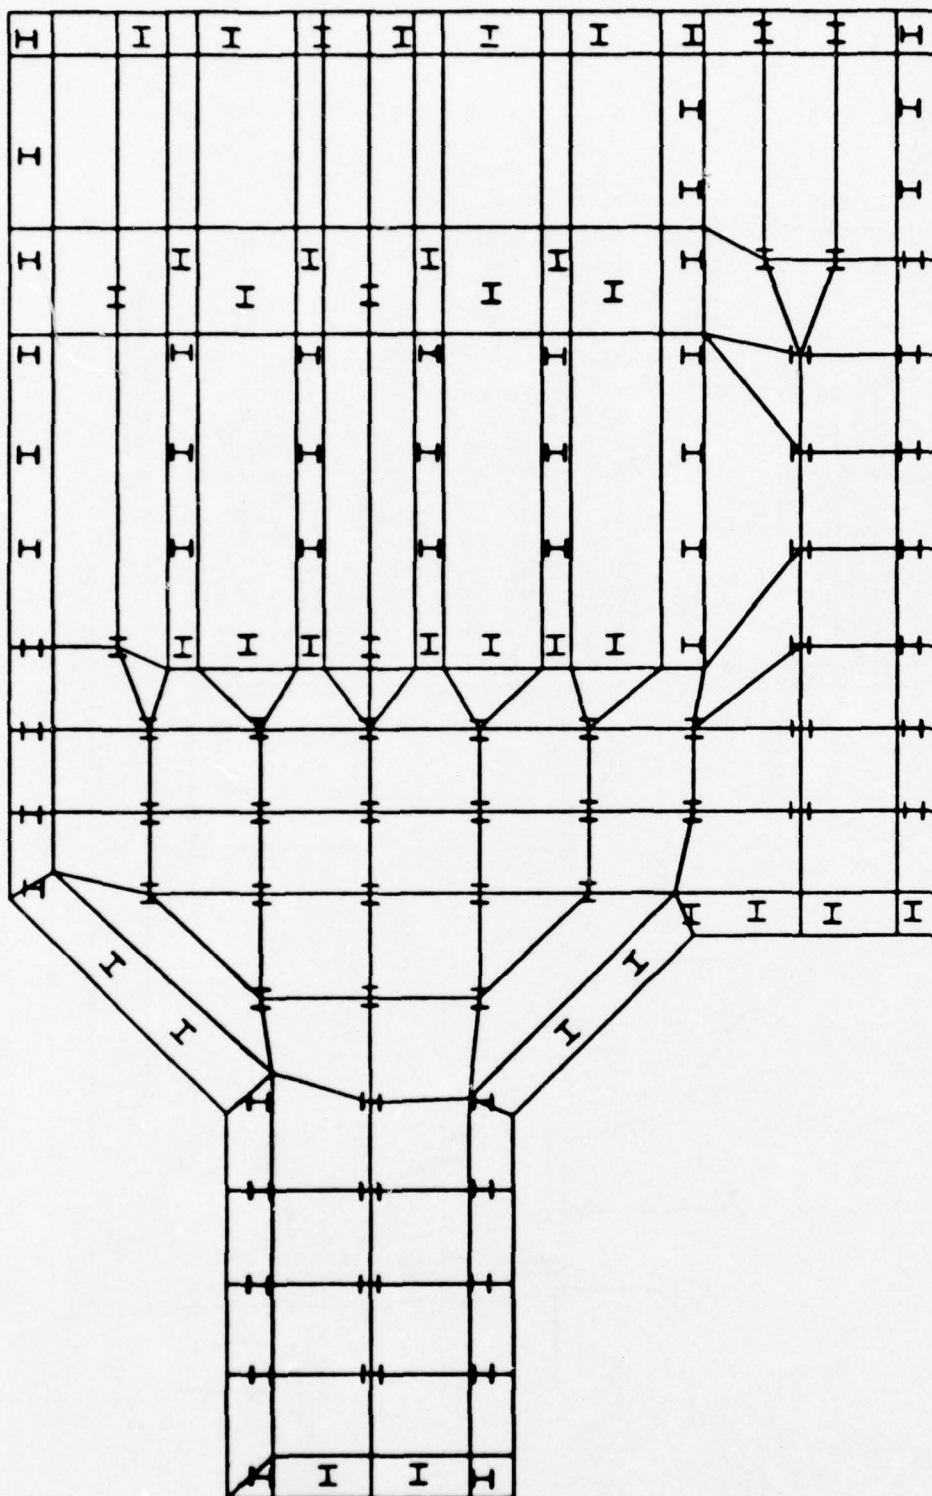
Finite element idealization of pile layout with plates for pile-founded pump station
